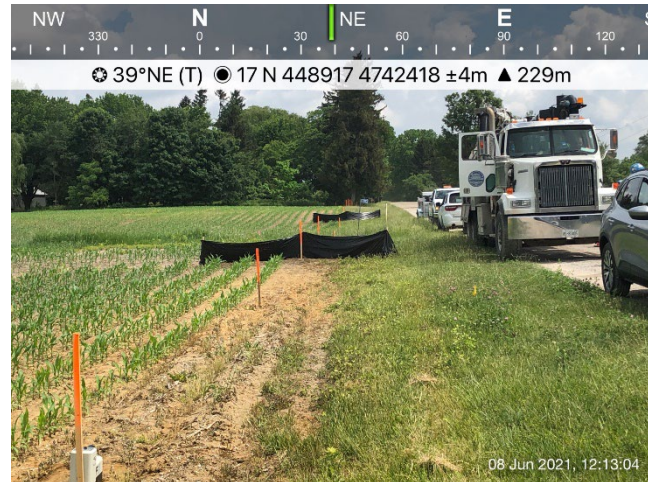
Silt fencing installed adjacent to Falconbridge Drive on both sides of WC80 as a precaution while conducting HDD installation of pipe.
